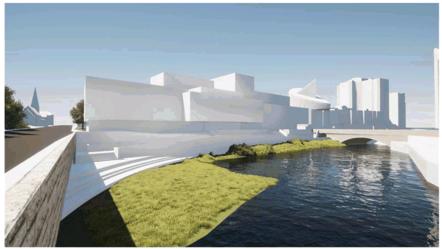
Concept design render looking north-east from Marsden Street bridge, Parramatta
